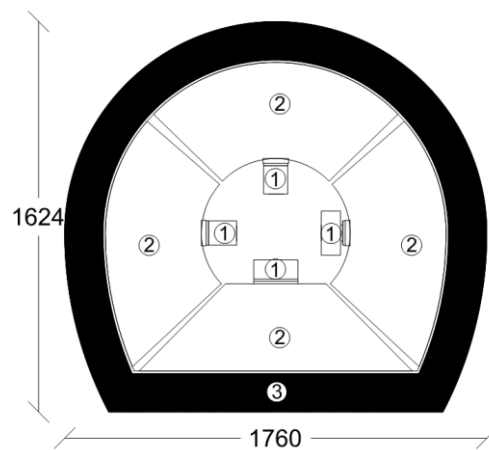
Geometry of the loading system 1) loading pistons, 2) load transfer plates, 3) reinforced concrete tunnel lining
